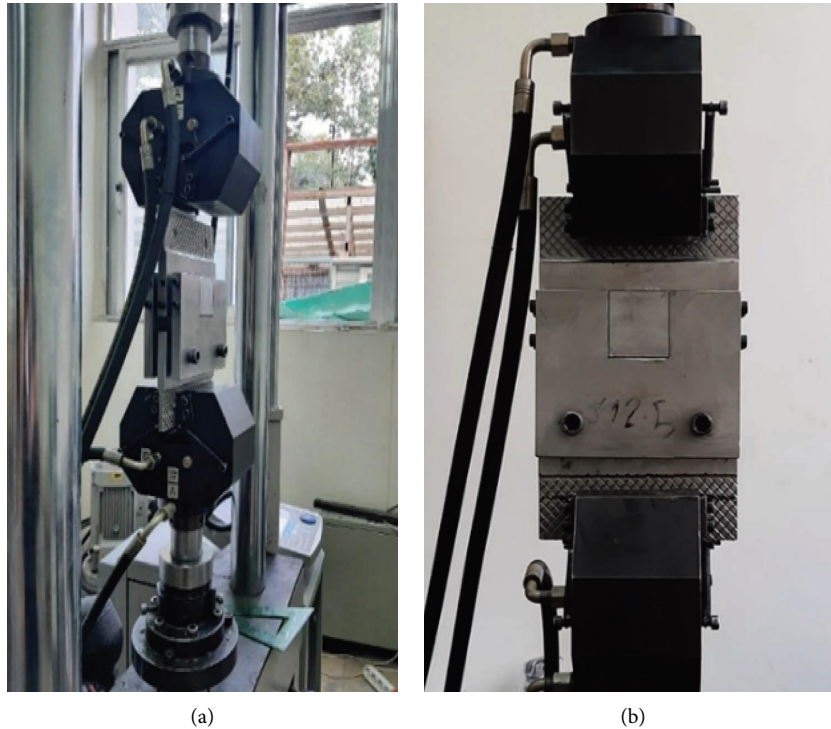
Cyclic shear test setup: (a) installation of damper specimen in test machine; (b) front view of damper under cyclic loading.
